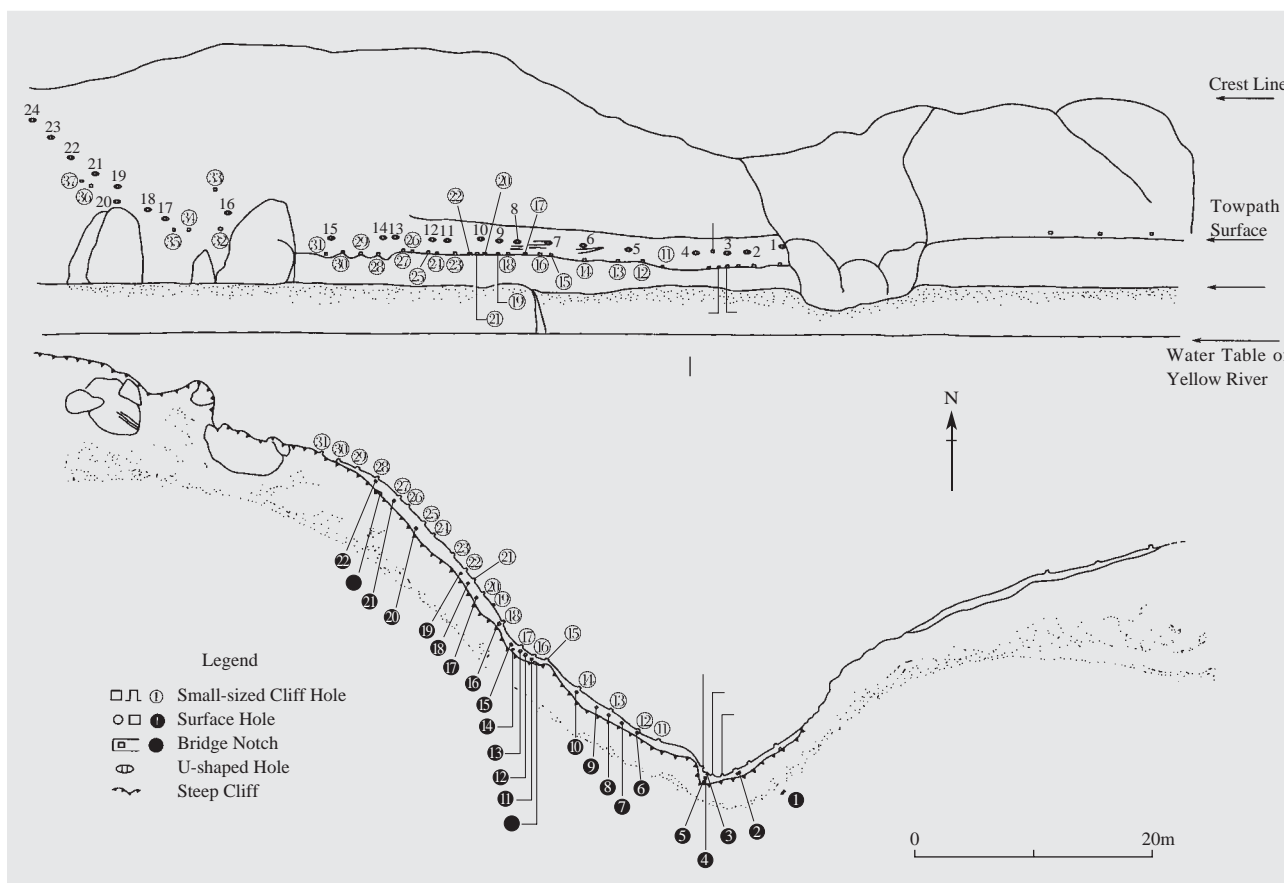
The Elevation and Plan of Towpath Remains of Section Six
